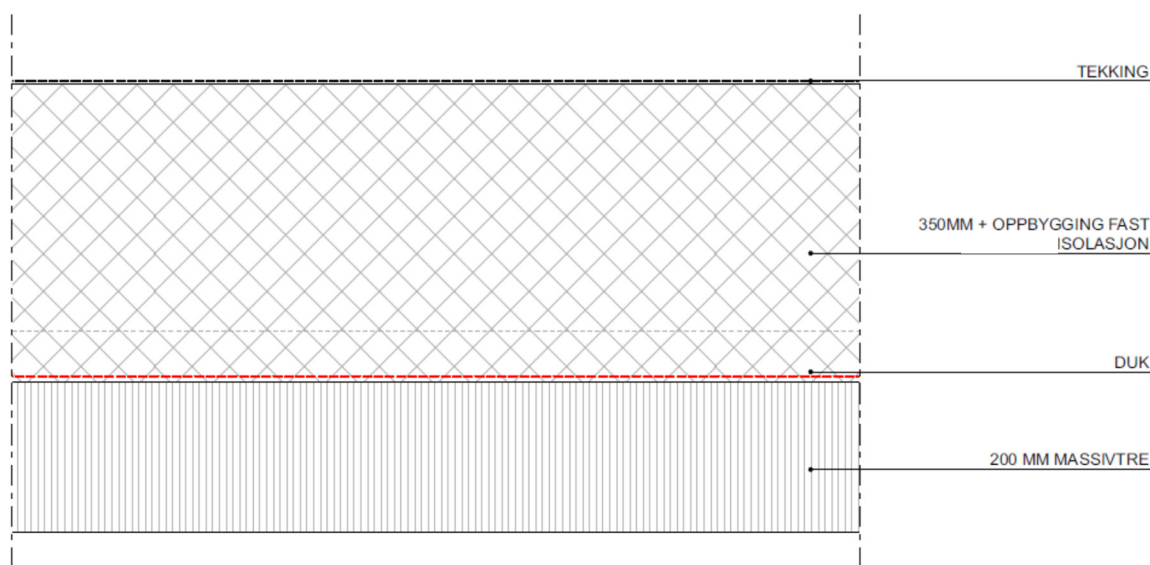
Detail of outer roof, courtesy of Ola Roald AS.
